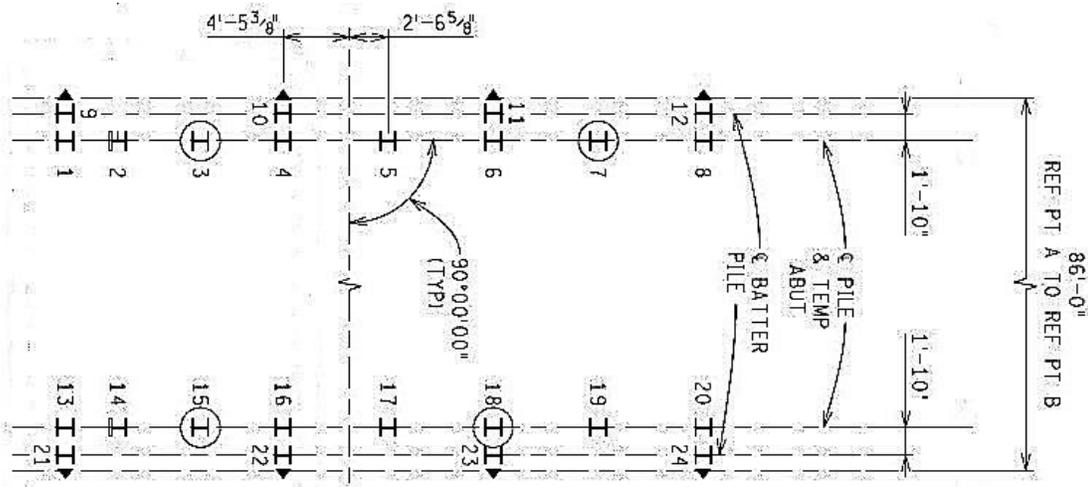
Top view of the US-131 NB bridge temporary extended pile arrangement
